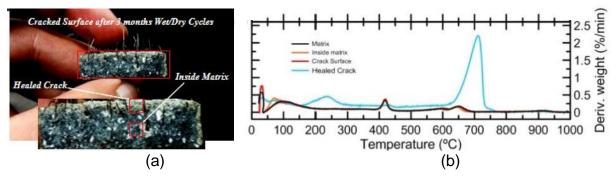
detail of a cracked specimen surface with located samples for TGA (a); TGA results for matrix and crack surfaces of non healed and healed specimens (b).
